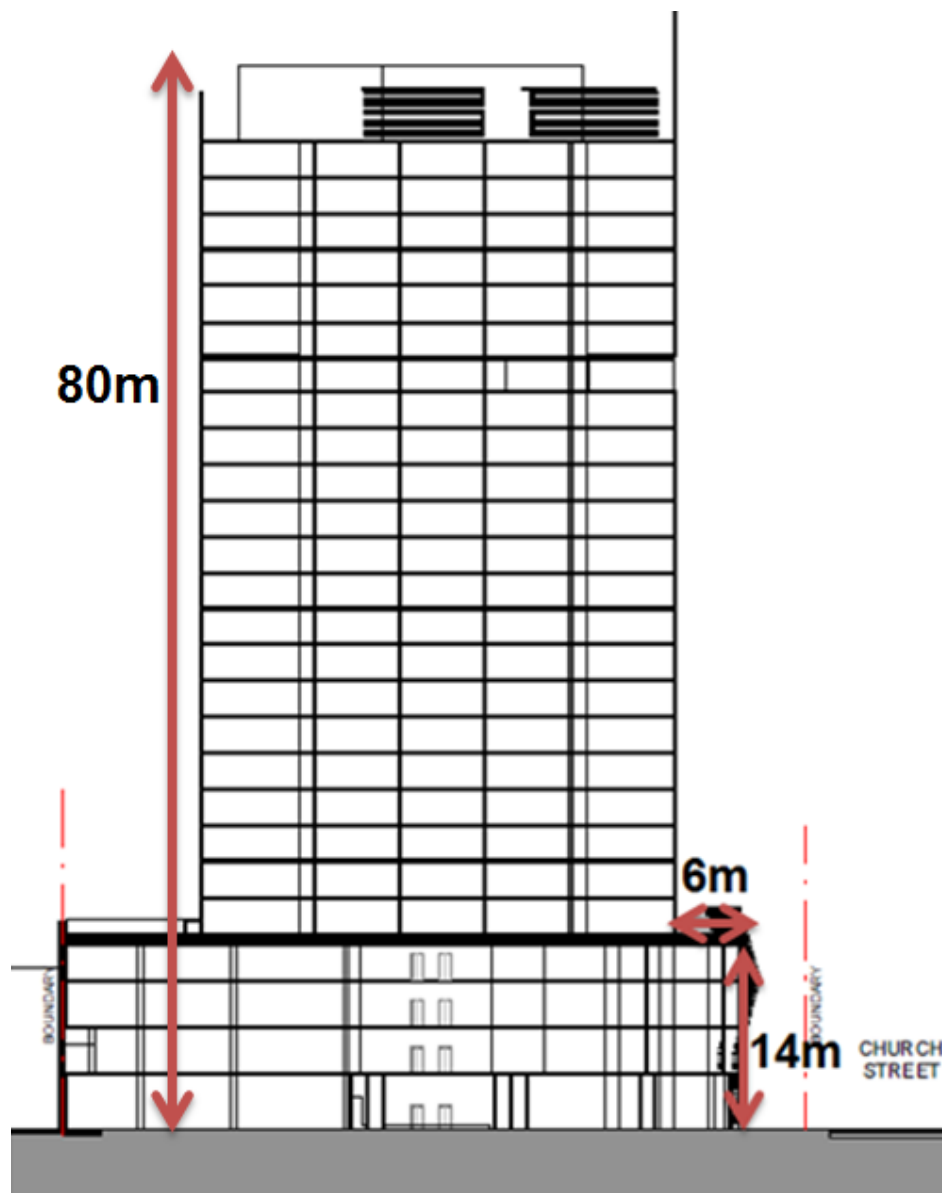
Development concept (Source: Applicant's Urban Design Report)
